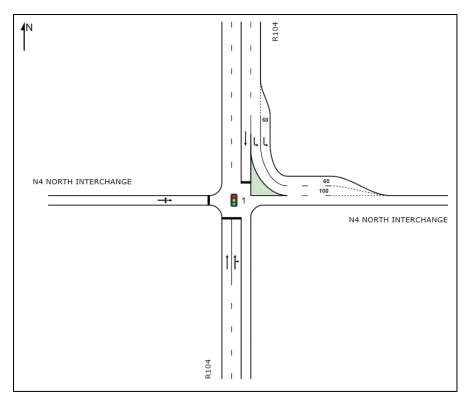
Intersection 1 Proposed Layout (2026 Background Traffic)
